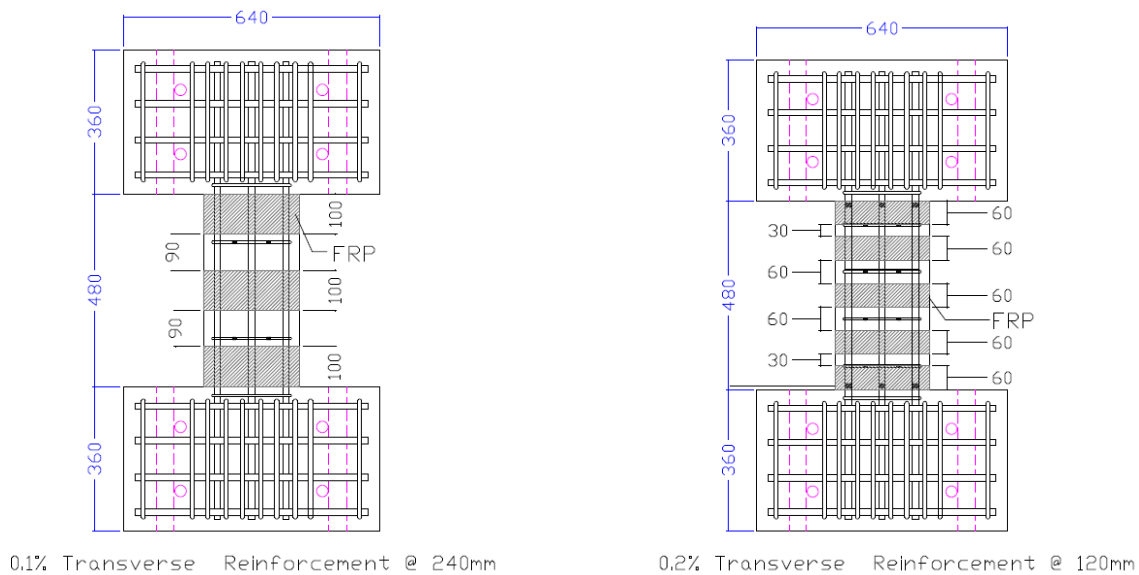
Drawings of CFRP retrofitted specimens
